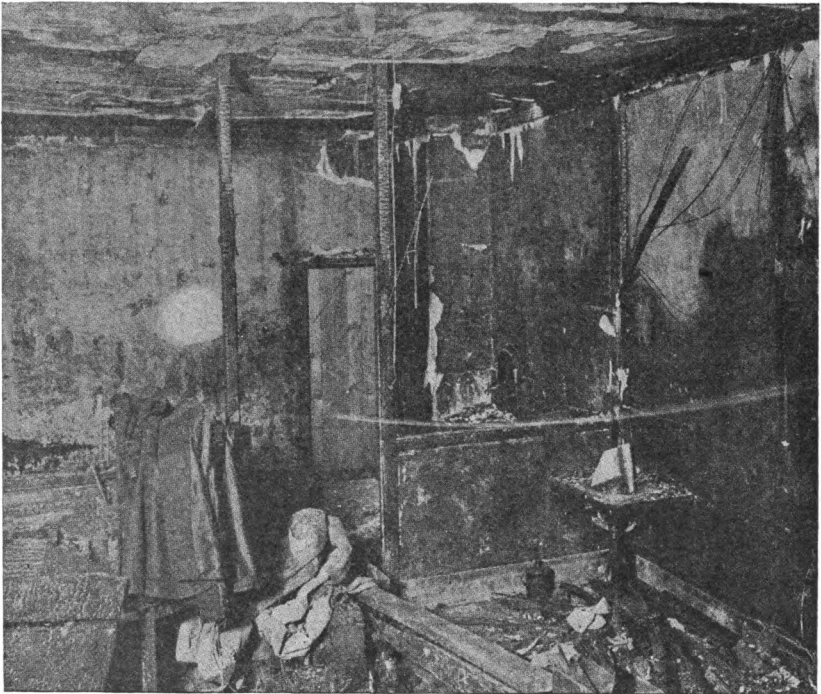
A Hot Fire in One Room of a Chicago Fireproof Building
